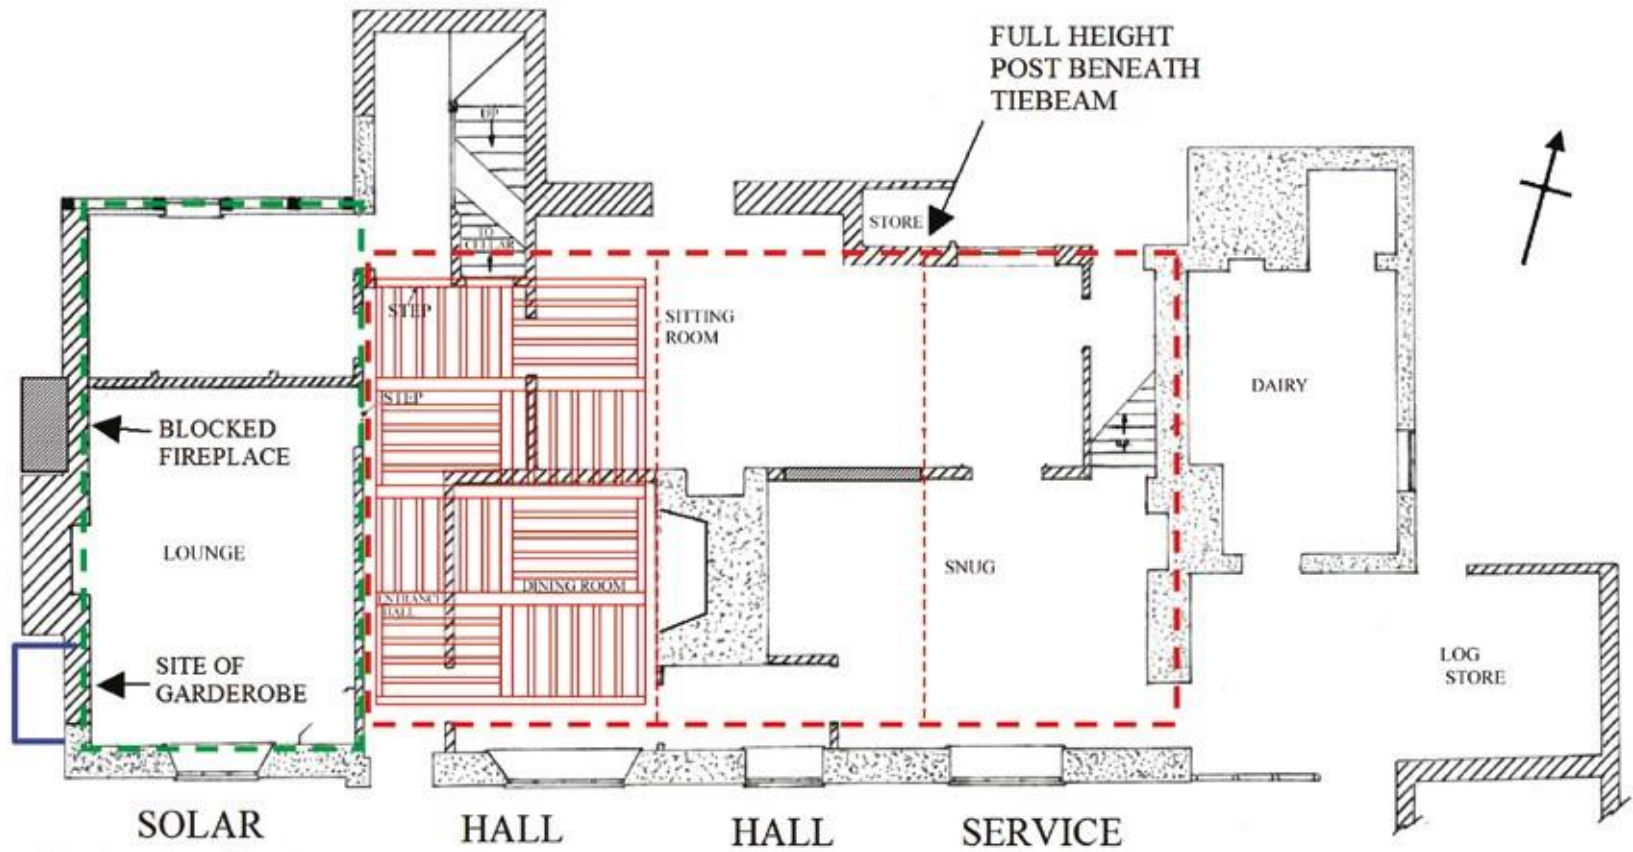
Church House Farm, Wellington. A sketch plan showing the likely layout of the hall range and the position of the inserted counterchange ceiling
